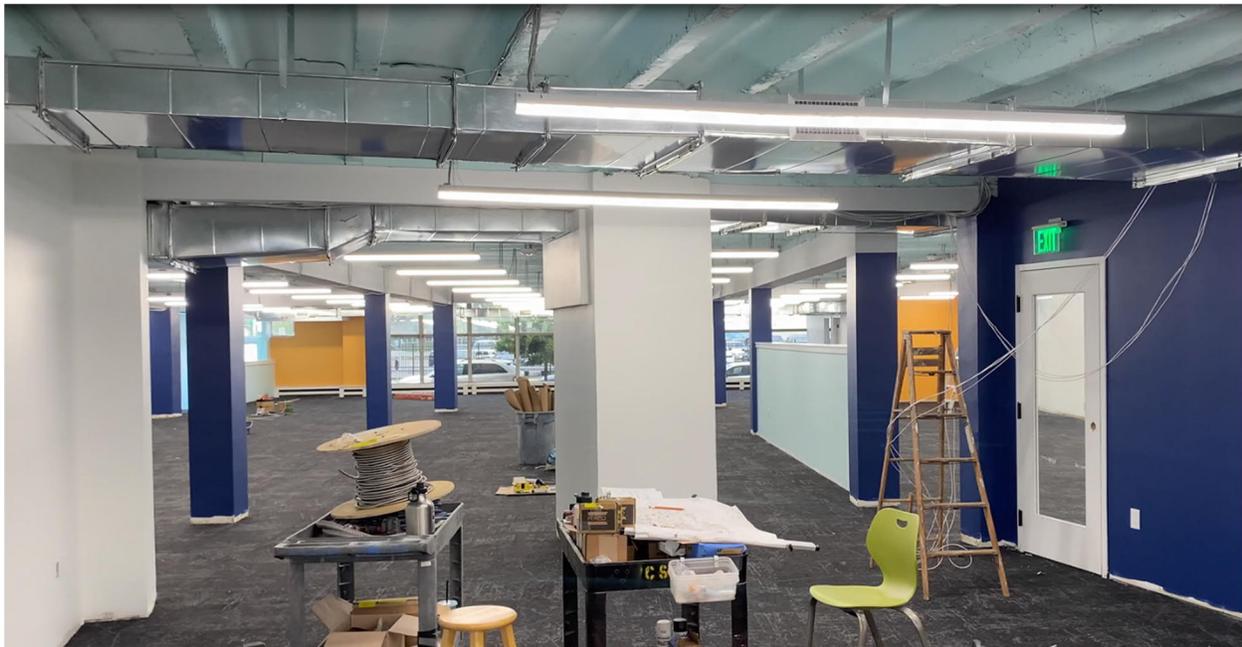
Existing 1<sup>st</sup> Floor Conditions with No Ceilings and Exposed Ductwork
